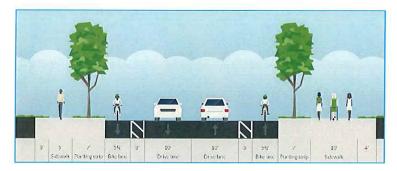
Proposed Typical Cross Section for Evergreen Dr
